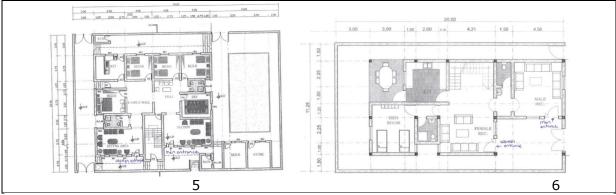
Detached house plans in Sudan (Khartoum) numbered 5 and 6
